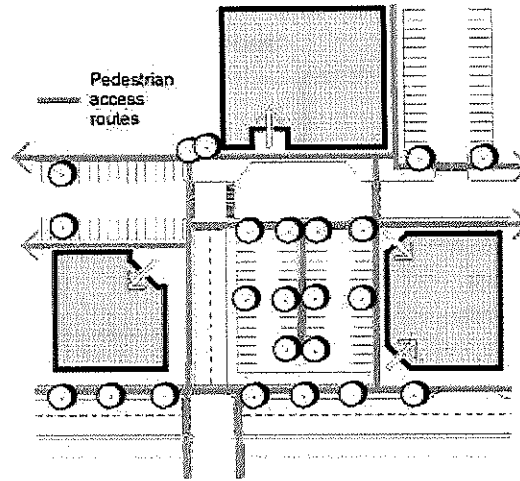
Good internal pedestrian circulation. Note connections from the street, between buildings and through parking lots.
